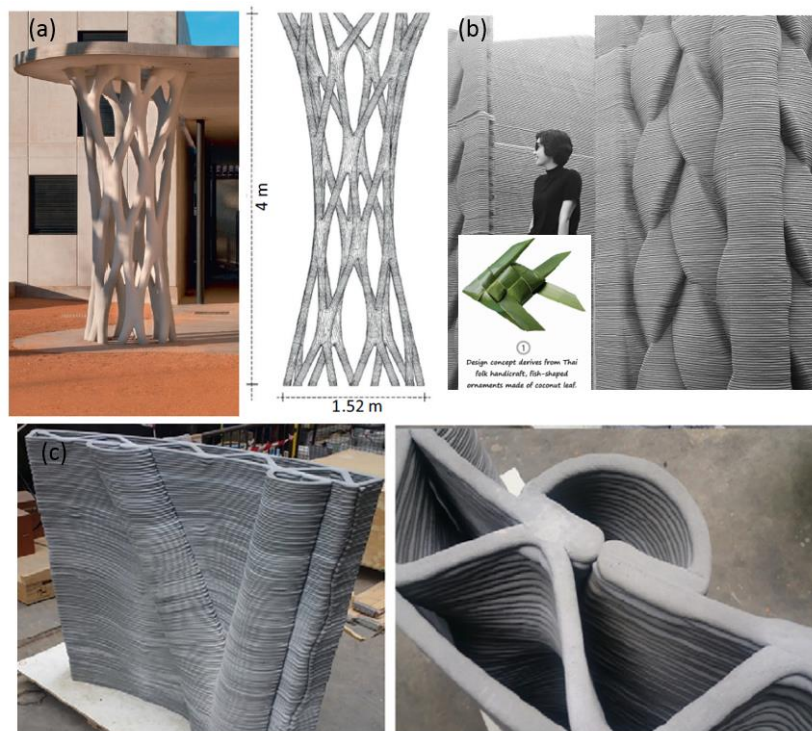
(a) Complex truss-shaped structure (XtreeE 2017) (b) Weaving concrete printed structure (3dp 2018) and (c) 3D printed concrete wall by XtreeE (XtreeE 2017)
